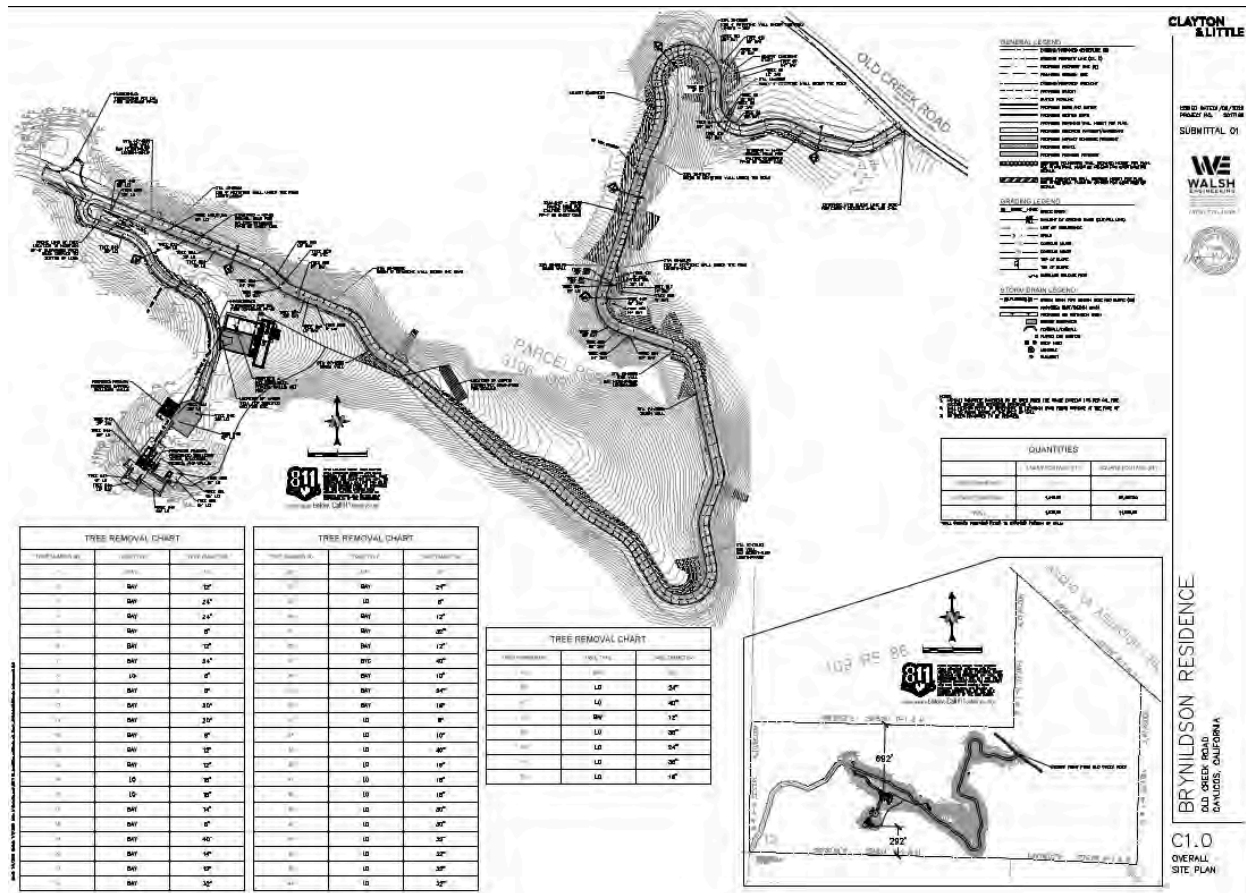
Site Map (Walsh Engineering, dated 1/6/20)
